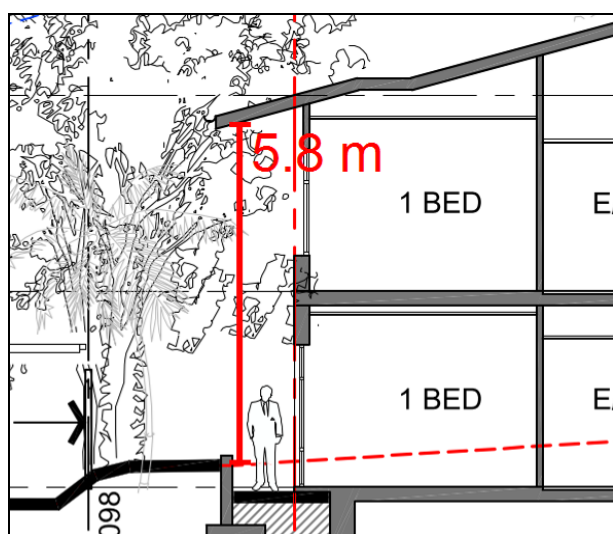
wall height at eastern elevation. The red dashed line is the existing ground line
